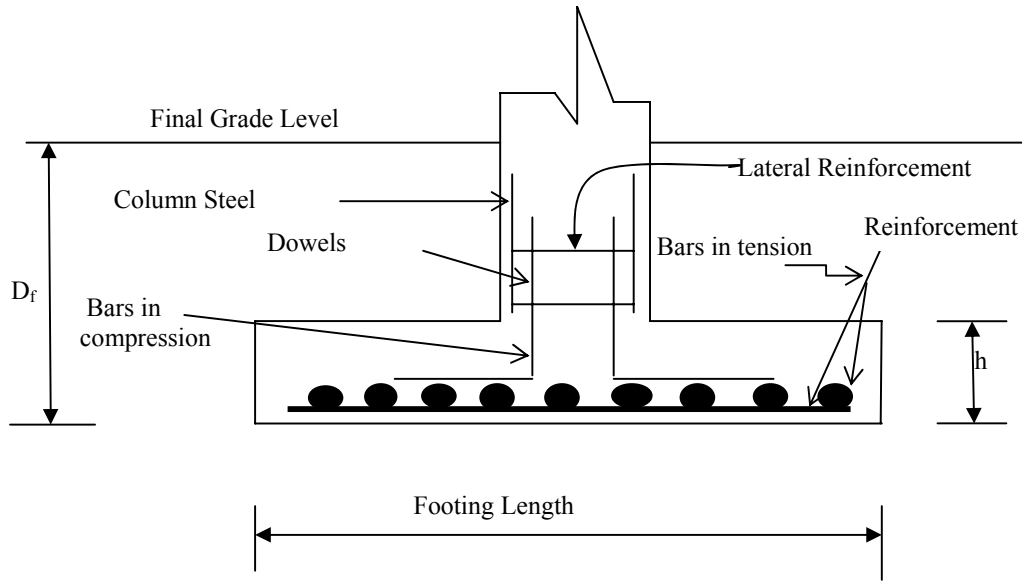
Isolated Footing Dimensions and Reinforcement Detailing
